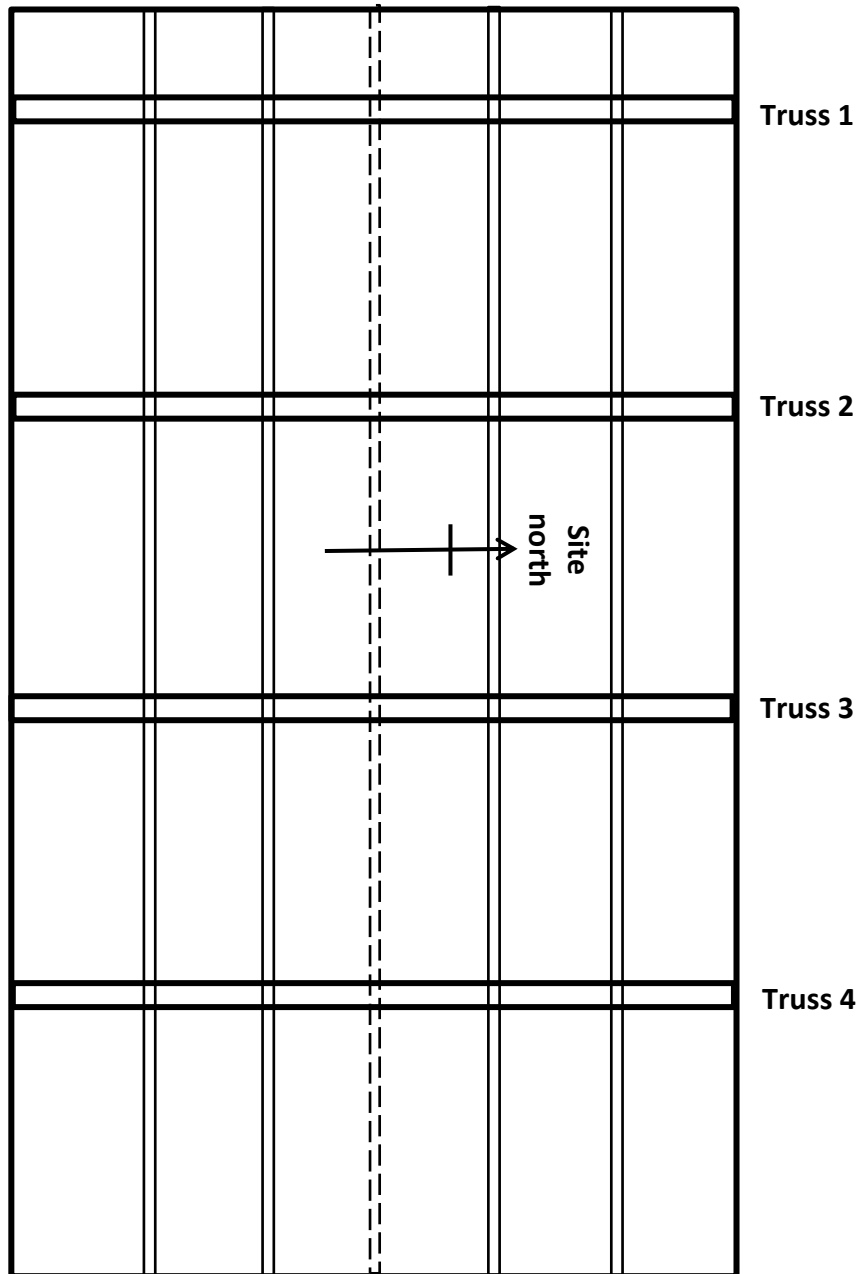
Simple schematic plan of the south range roof to show the layout and arrangement of the trusses
